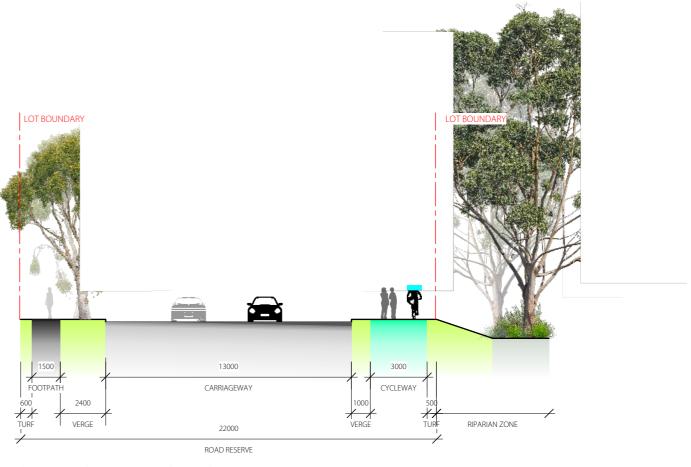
Perimeter Road - Typical Section (Source: Terras)
